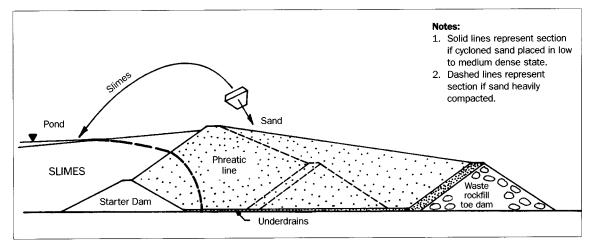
Downstream construction using cycloned sand and waste rock toe (after Klohn, 1980).
